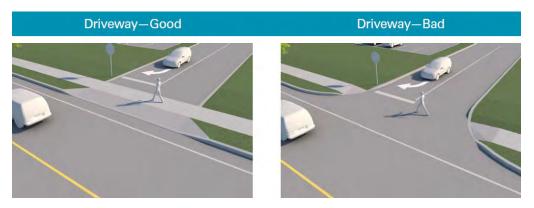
Sidewalk and Driveways (Source: CSDG)
